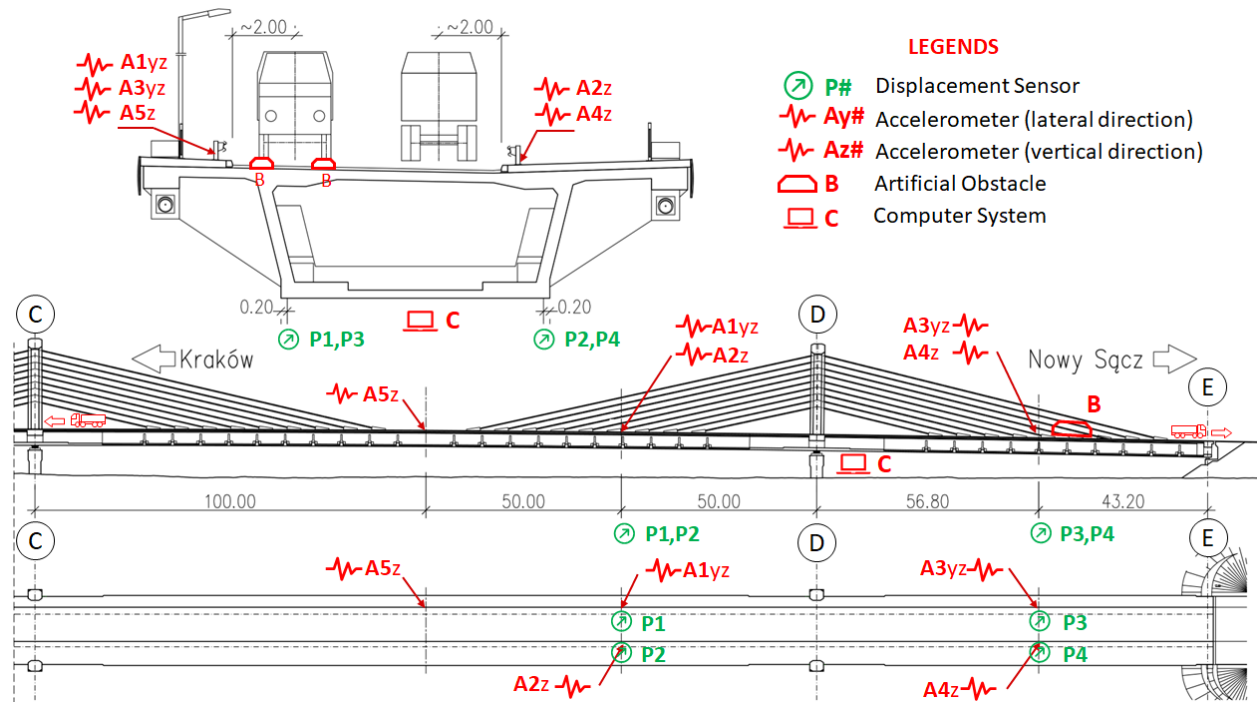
Arrangement and placement of sensors along the bridge cross-section used in the dynamic load test
